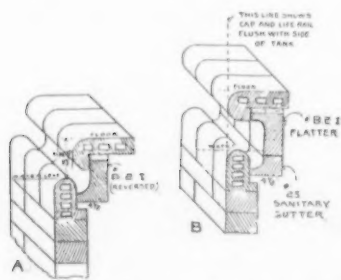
SECTIONS A AND B SHOWING HEIGHTS OF FLOOR ABOVE WATER LEVEL OBTAINED BY USING ONE OR MORE COURSES OF STANDARD OR FLAT STRETCHERS ABOVE SANITARY GUTTER.
